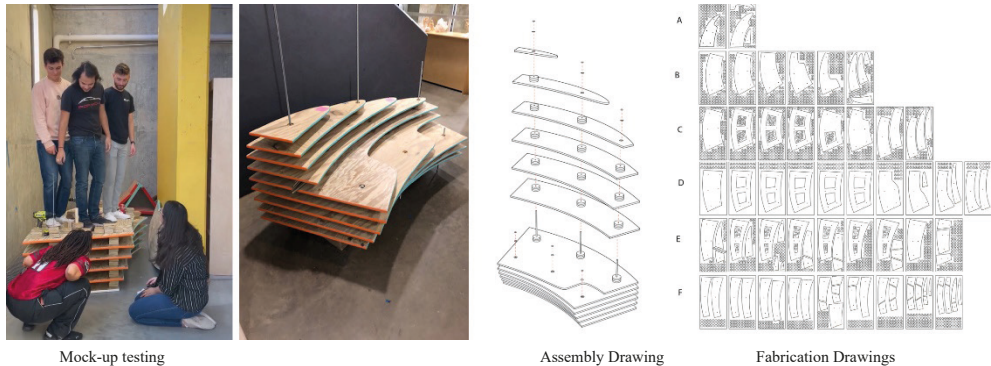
Fibonacci Nook | Shop Drawings | Assembly Details | Mock-up and Testing
